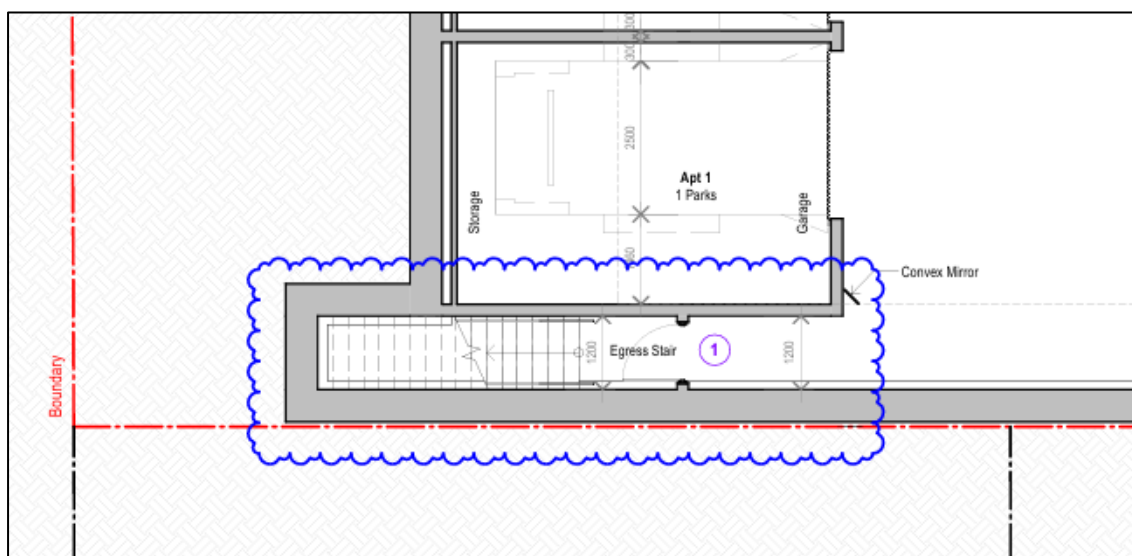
Proposed fire egress stair location – Basement Extract (Source: ELK Architects)
